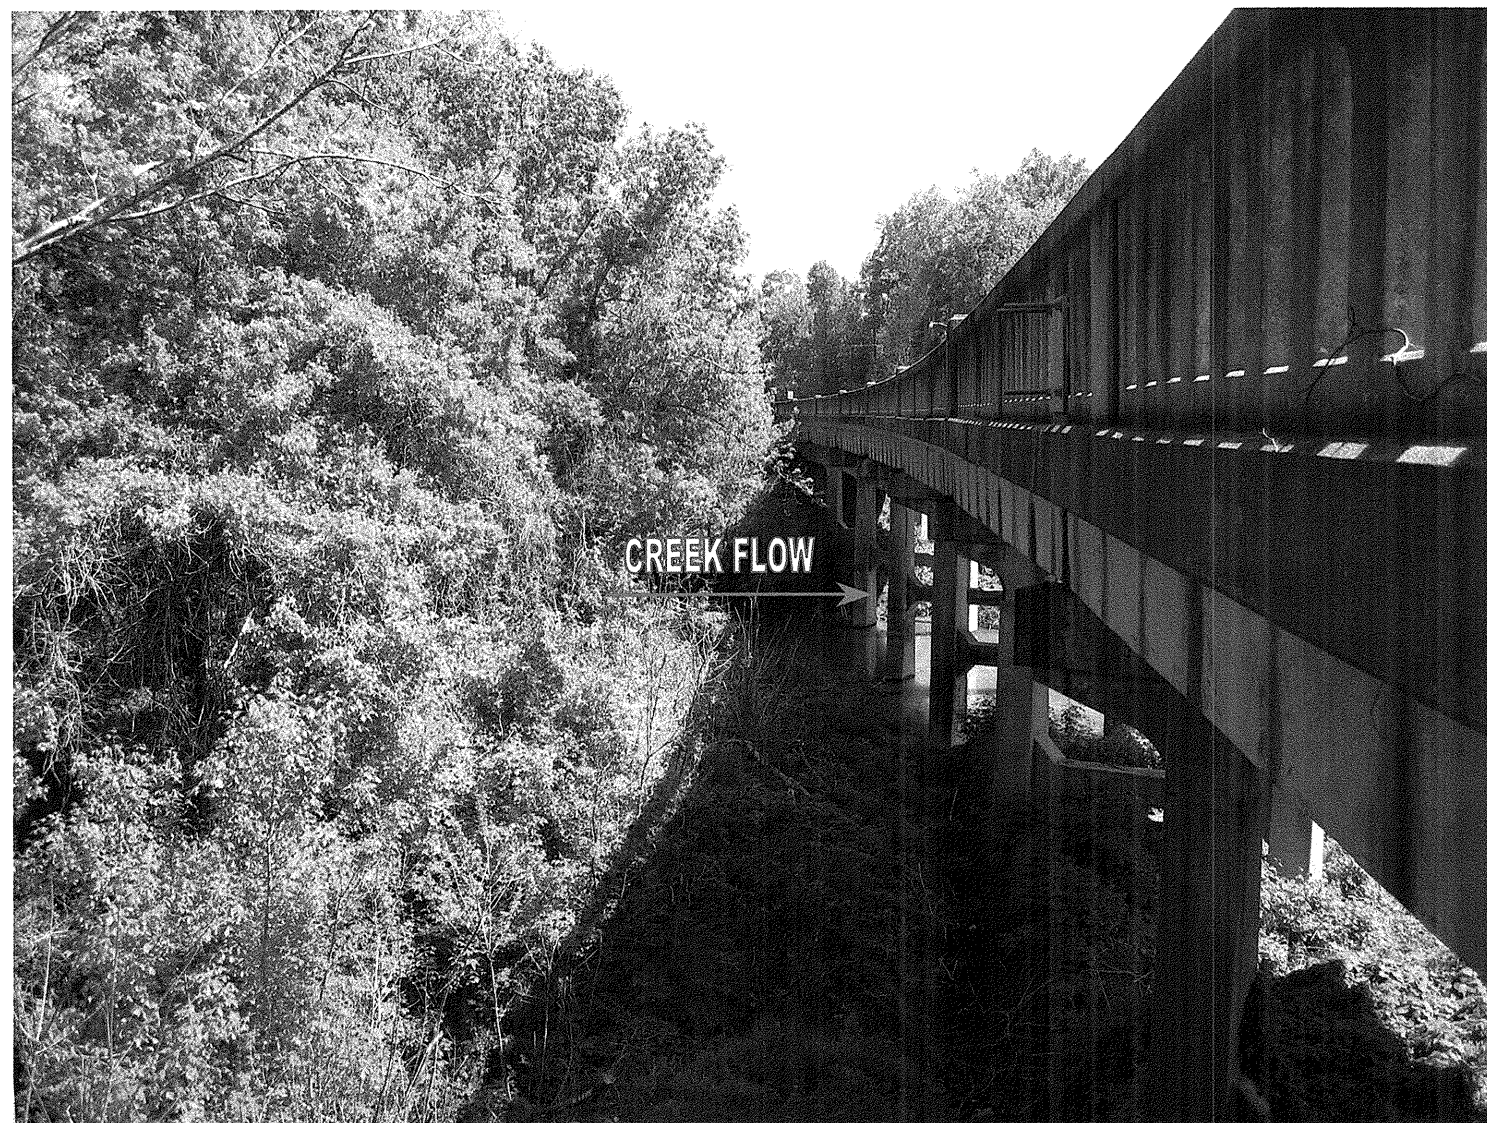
PHOTO TAKEN FROM THE LEFT SIDE OF EXISTING END BENT ONE LOOKING TOWARDS THE SOUTH YADKIN RIVER. PROPOSED END BENT ONE (-L-) IS LOCATED APPROXIMATELY 40' LEFT OF THIS POSITION.
